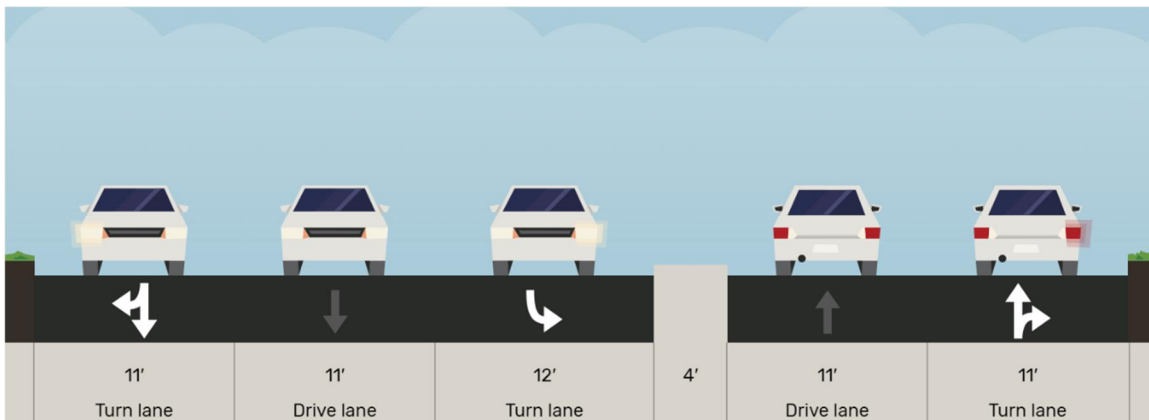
Huntington Avenue Existing Conditions Cross Section – With Median
